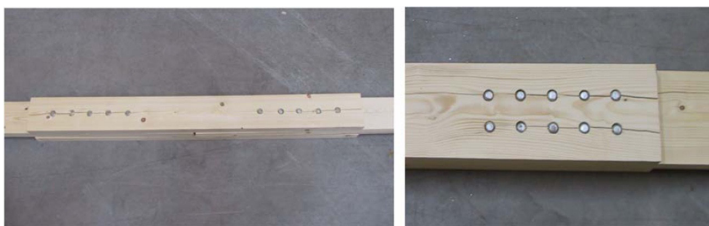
Two shear plane connection timber-timber – connection members are metal dowels.
